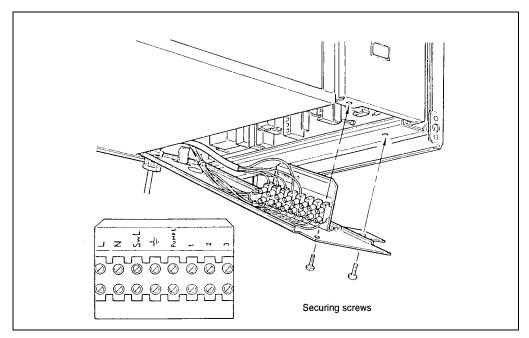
ACCESSING TO THE BOILER ELECTRICAL TERMINAL BLOCK & ROUTING OF ELECTRICAL WIRING
